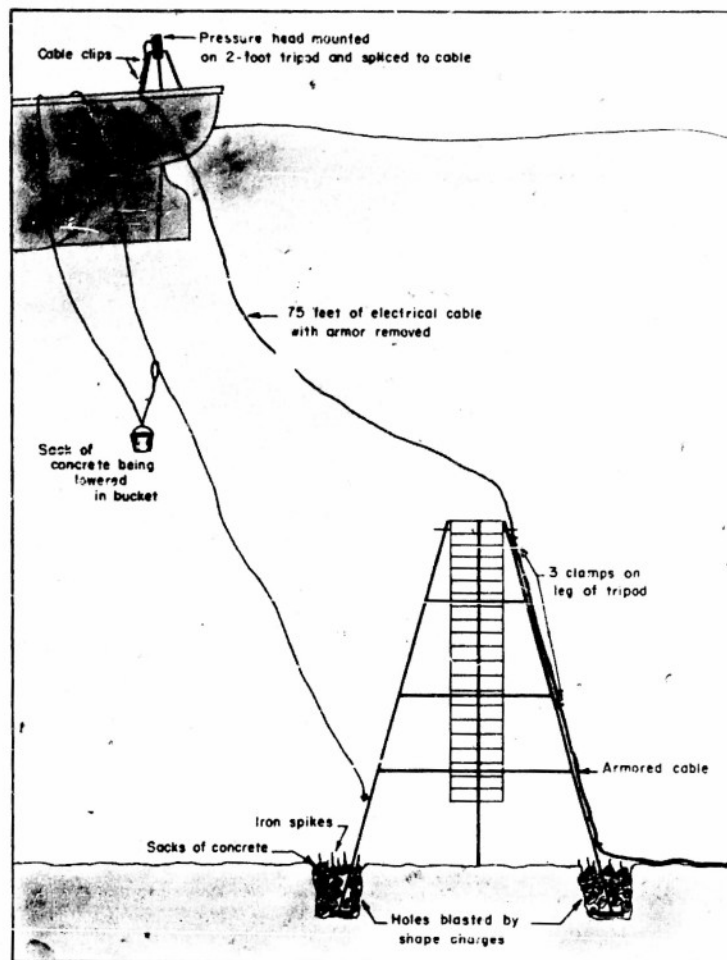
Schematic diagram of cementing tripod to bottom and splicing pressure head to cable
